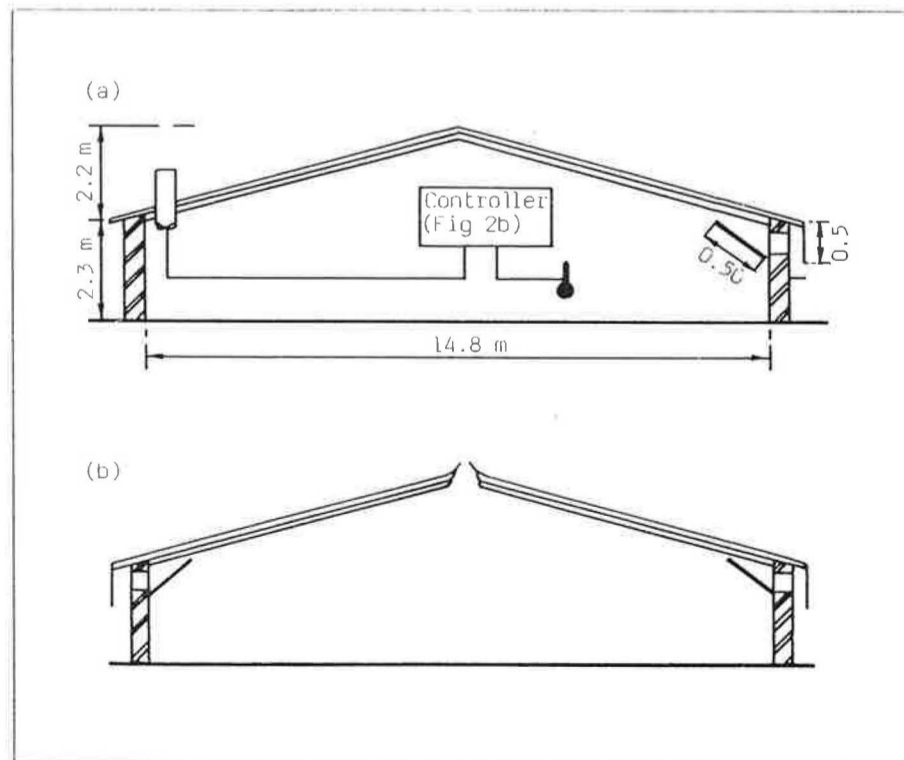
(a) Mechanical ventilation system, exhaust fan and proportional controller. Length of house: 19 m. (b) Natural ventilation system, open ridge. Inlets on both side walls to permit ventilation from wall to wall when there is no buoyancy effect in summertime.
